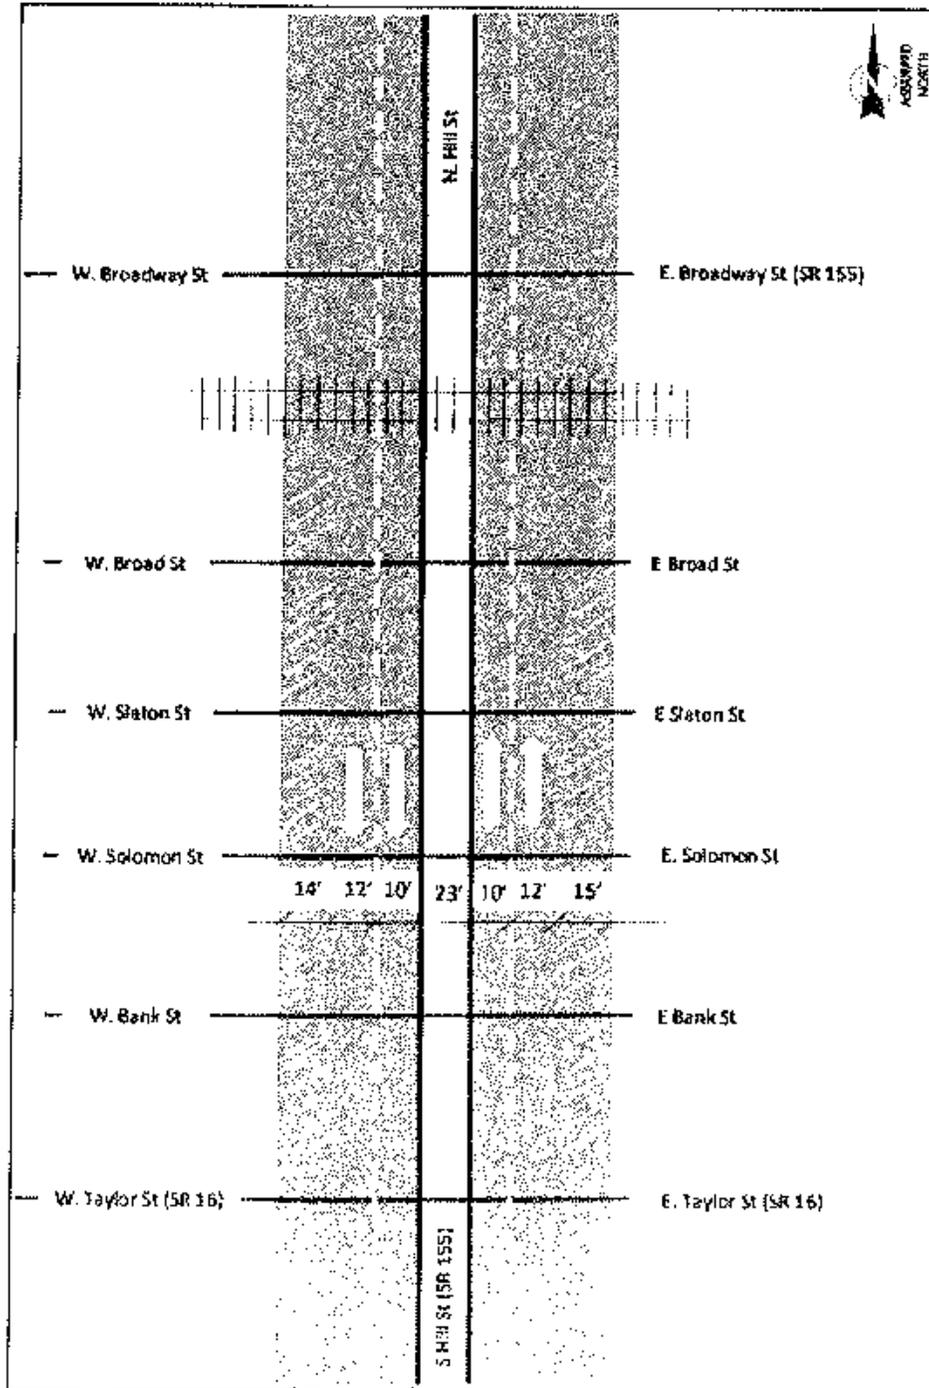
EXISTING CONDITIONS, N. HILL STREET
